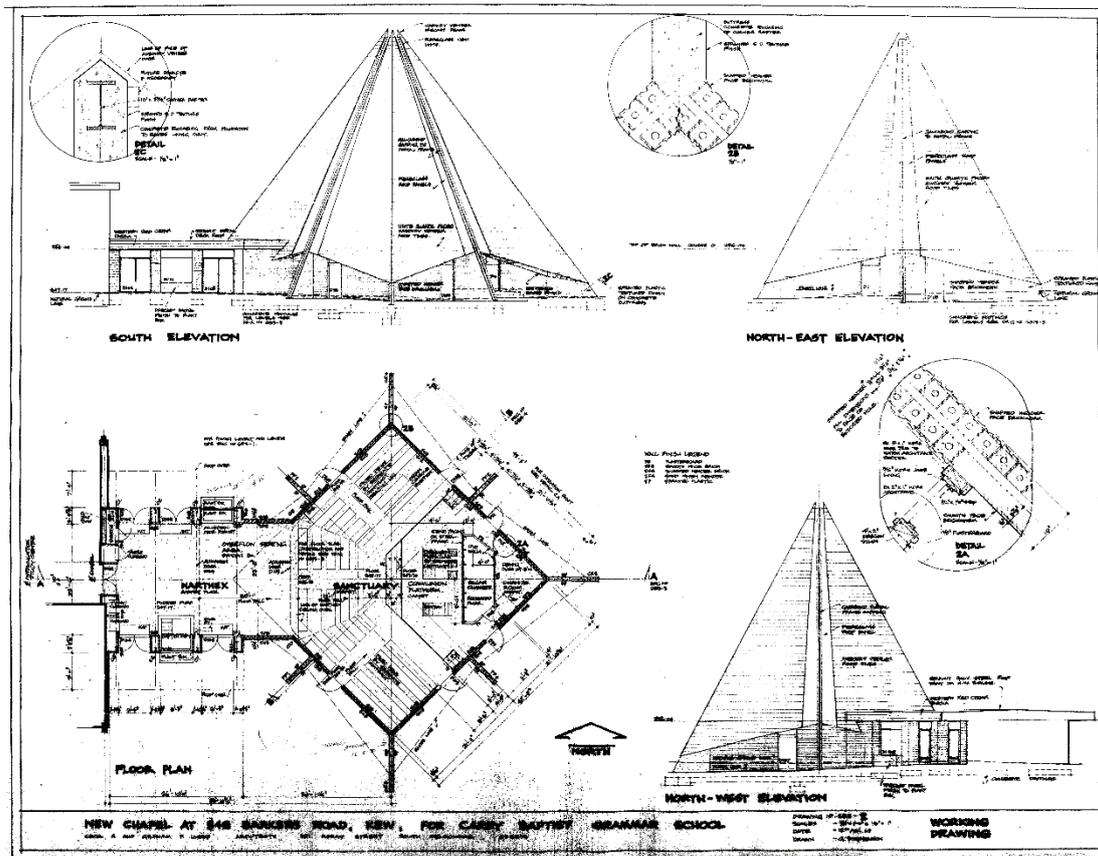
Floor Plan and Elevations for 'The William Carey Chapel'. (Source: Building Permit 1563)
